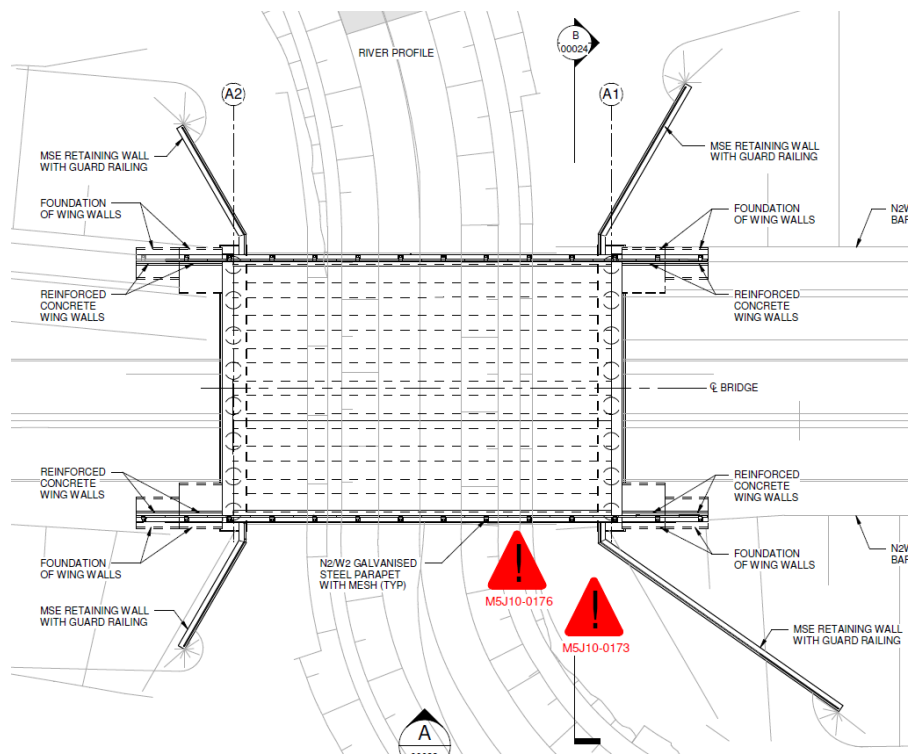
Plan of proposed square River Chelt bridge with straighter River Chelt
